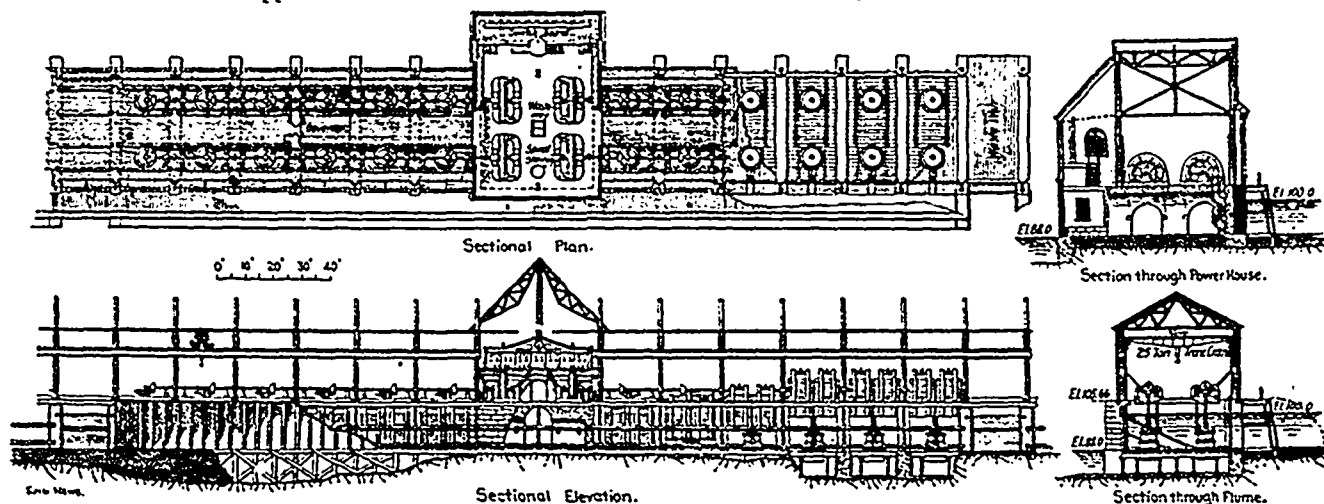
DIVISIONS THREE AND FOUR OF MAIN DAM, SHOWING PLAN, ELEVATION AND SECTION OF POWER HOUSE AND TURBINE SETTINGS.
